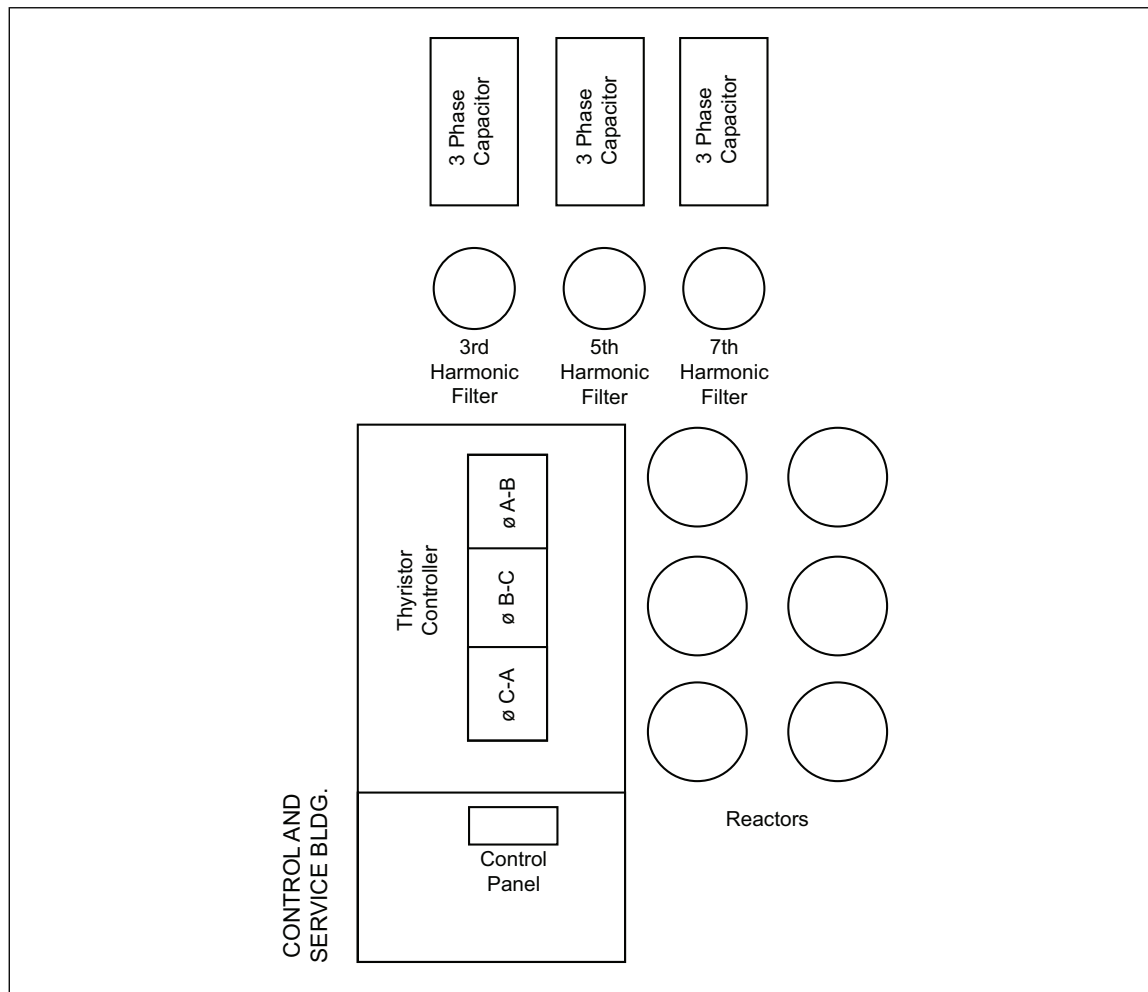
Typical layout of a 25 MVA static reactive compensator system.
